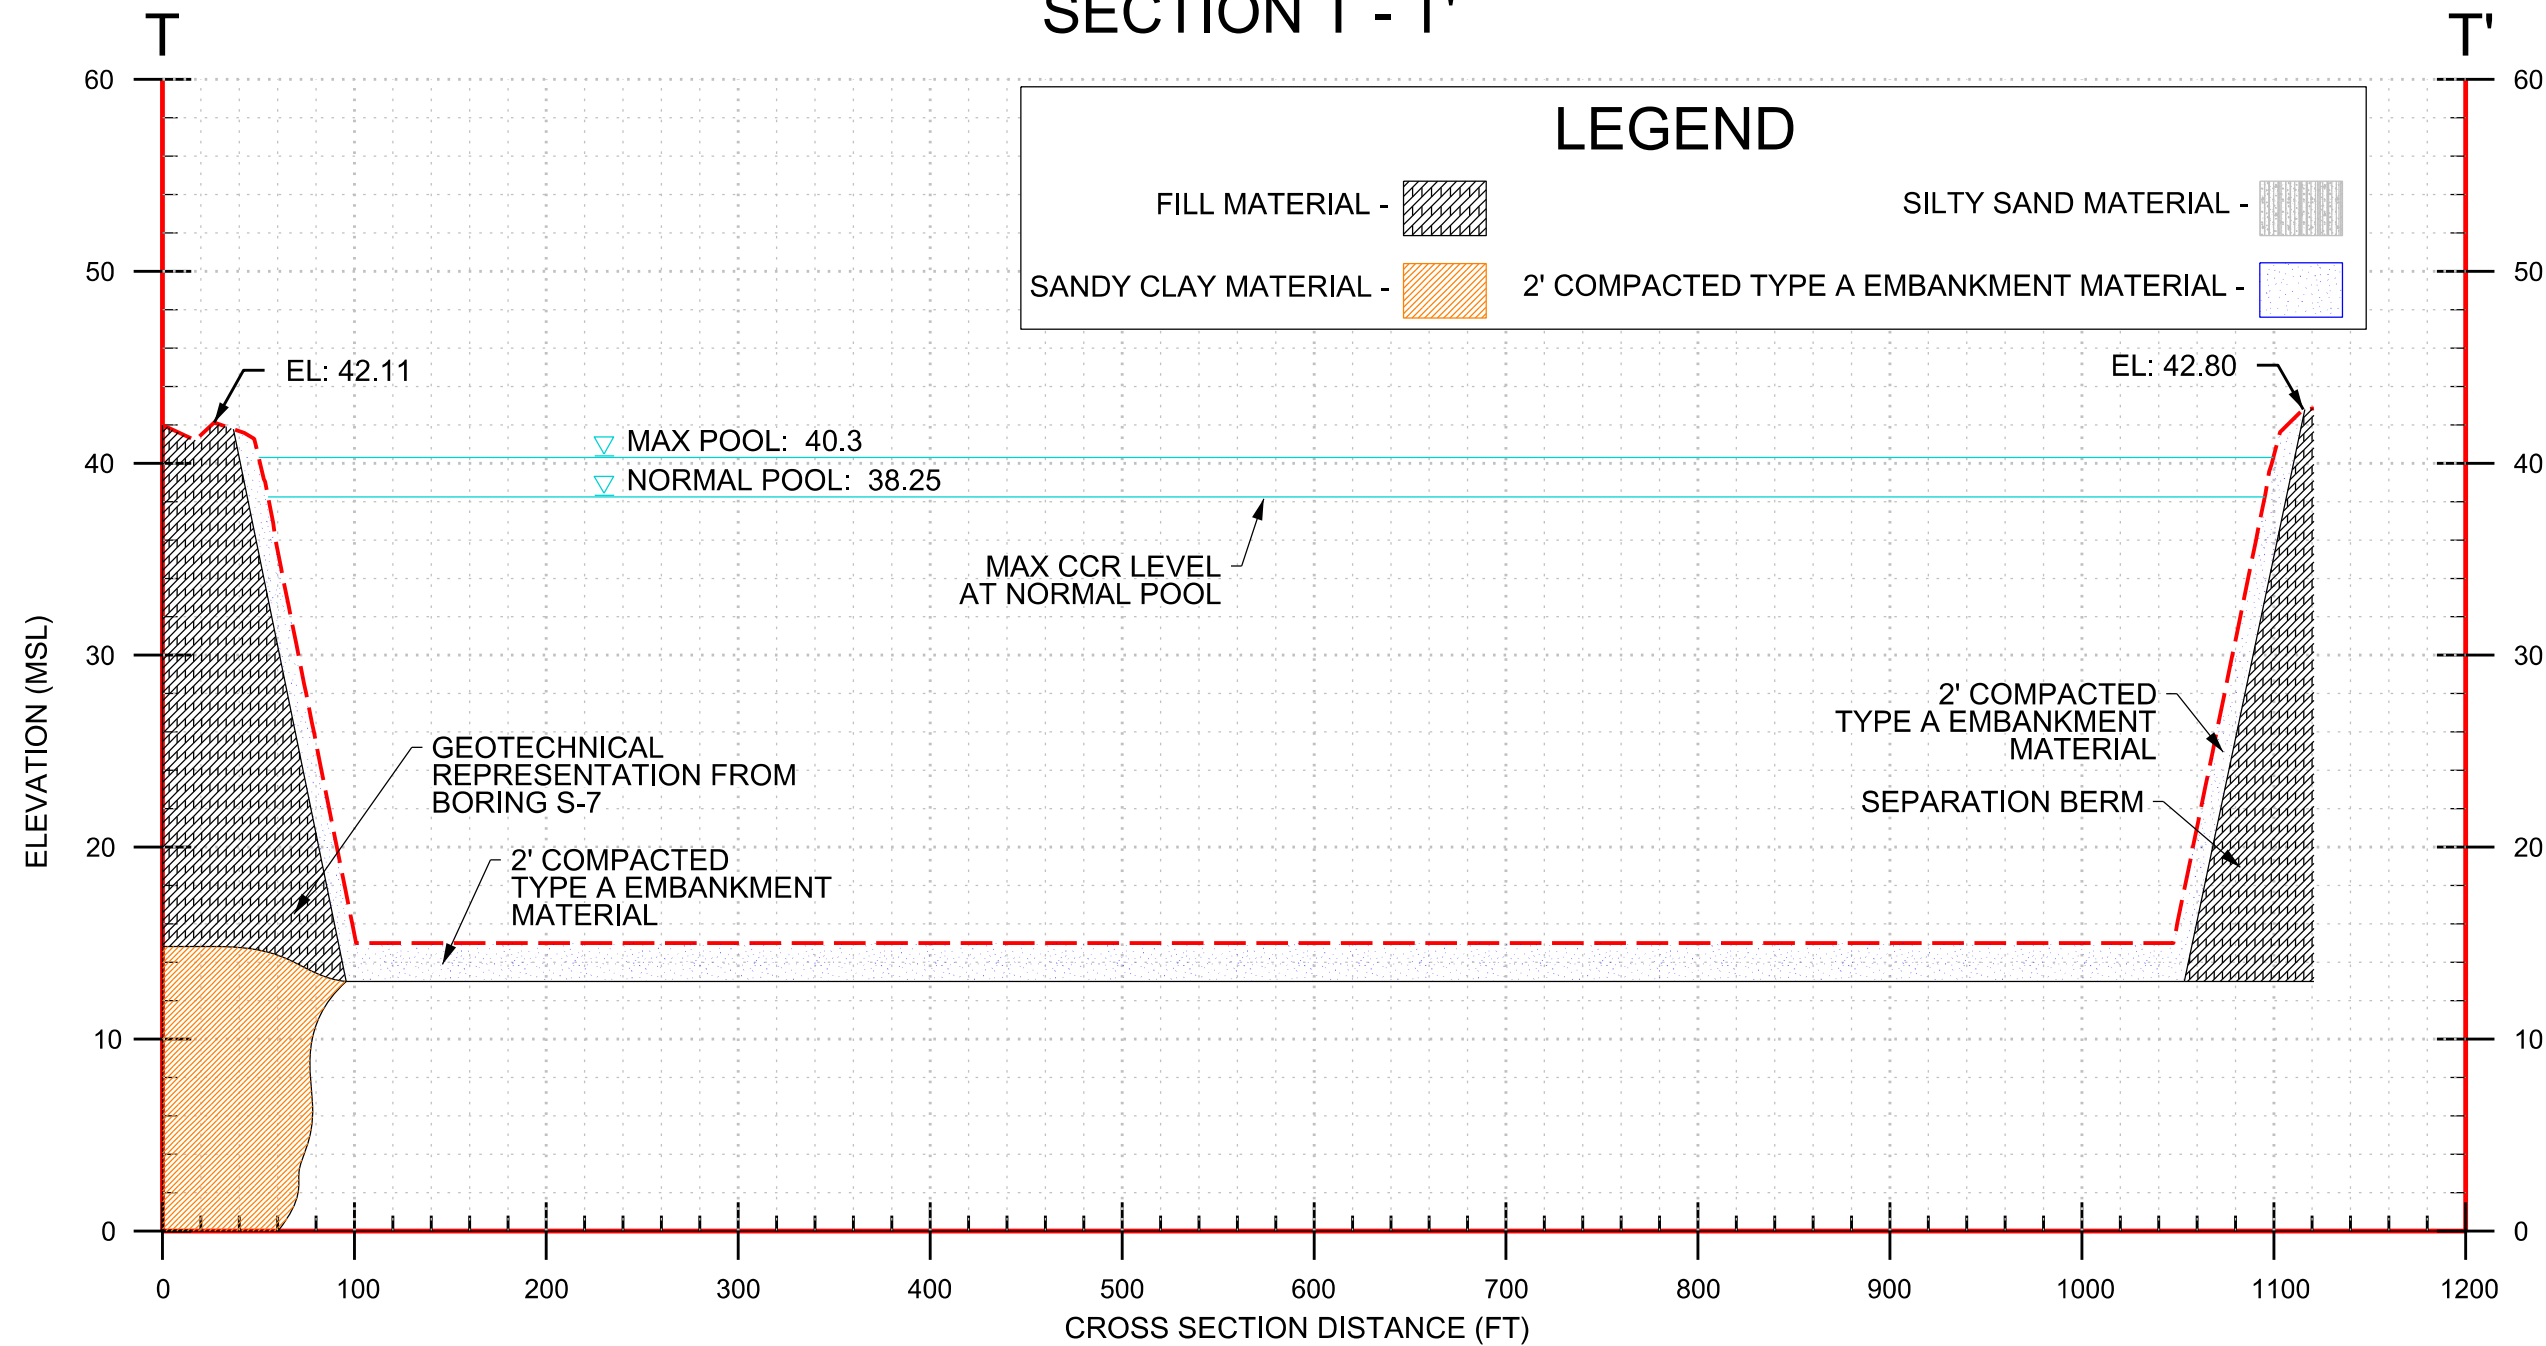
Unit 2/3 Bottom Ash Pond Section T-T'
